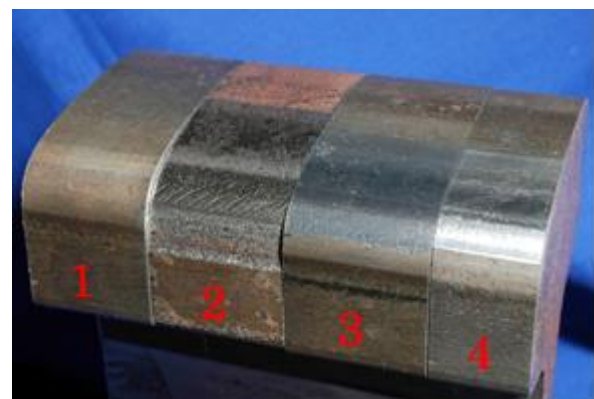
Rail head surface images after RCF and wear tests on a full scale rail wheel test rig at voestalpine: (1) - new rail; (2) - rail sample after 100,000 wheel passes dry; (3) - rail sample after 100,000 wheel passes with FM; (4) - rail sample after 400,000 wheel samples with FM. Significant reduction in wear and RCF development can be seen with FM application.
